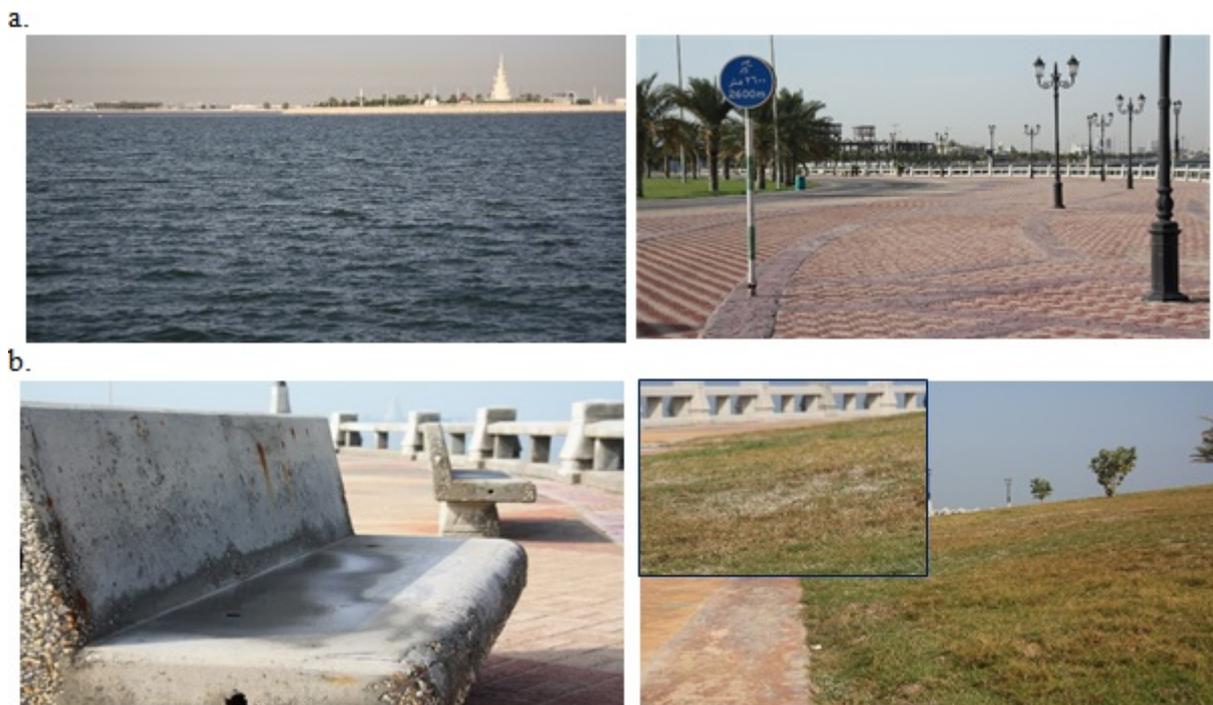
(a) The third segment of the KASP gains protection from constructed artificial island and road to it. It constitutes of two strips of grass-planed area and walkway (b) Effects of swash on pavements, street furniture and plants.
